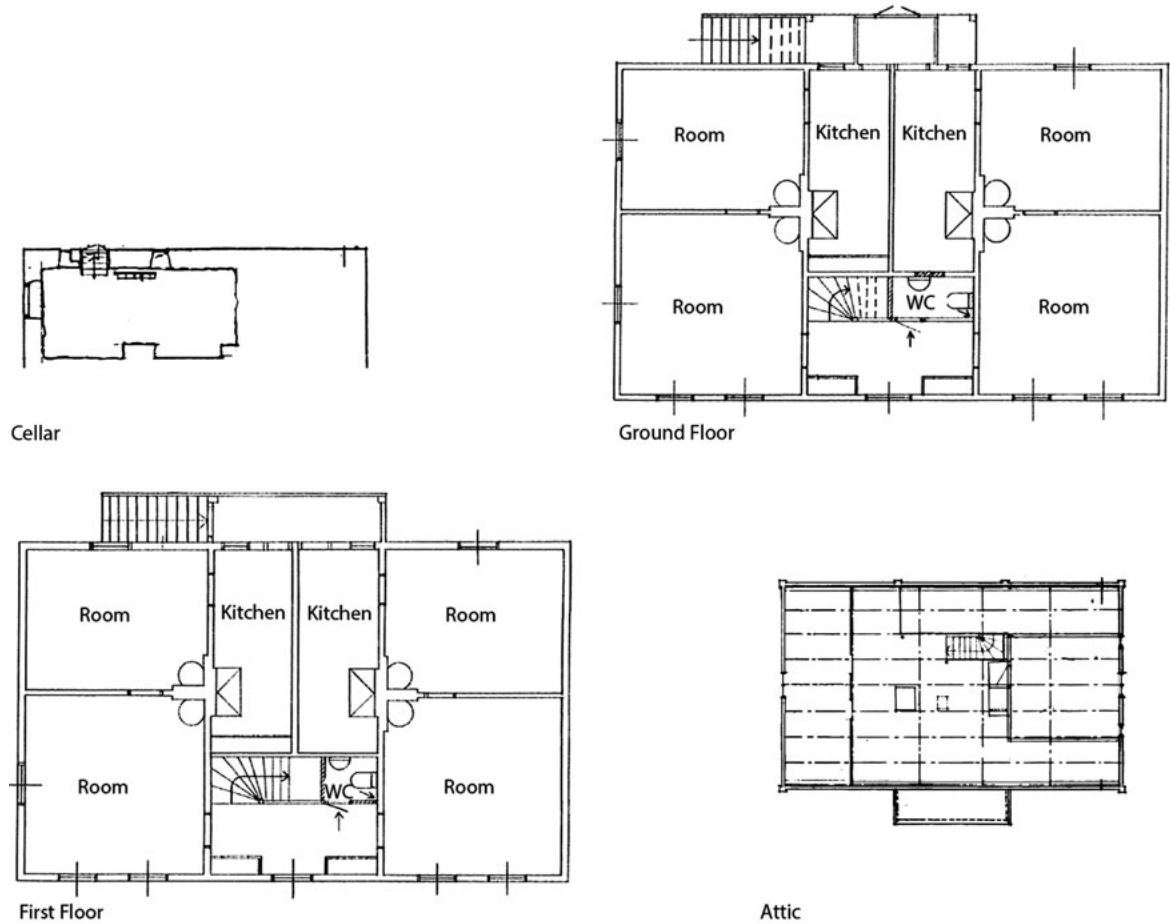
The layout of Hälleberget A. Byggnadsvårdsplan HIGAB
